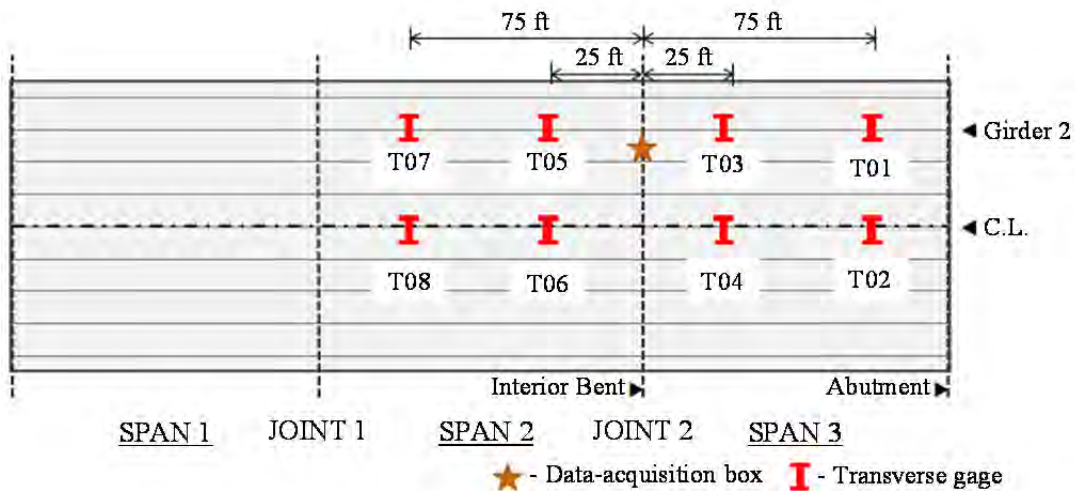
Gage layout for transverse bars, Wharton-Weems Overpass
